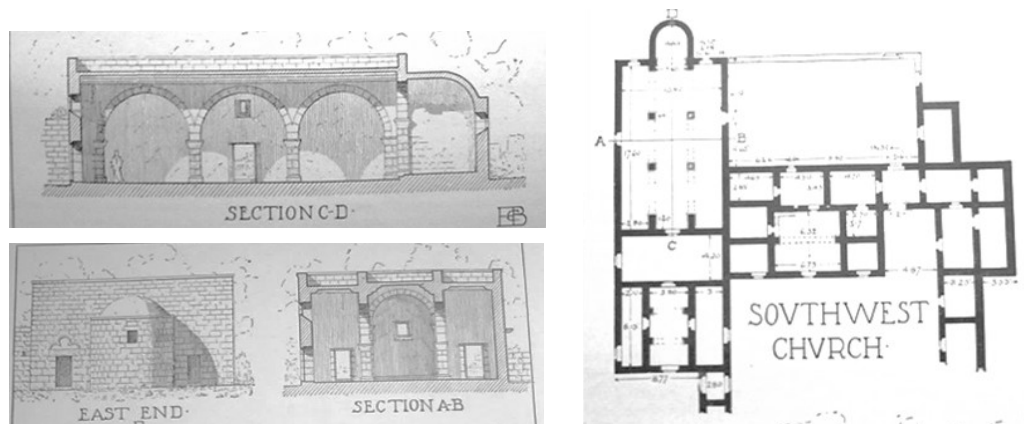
Southwest Church plan of 'Umm al-Jimāl, (Butler, 1913, p. 44)
